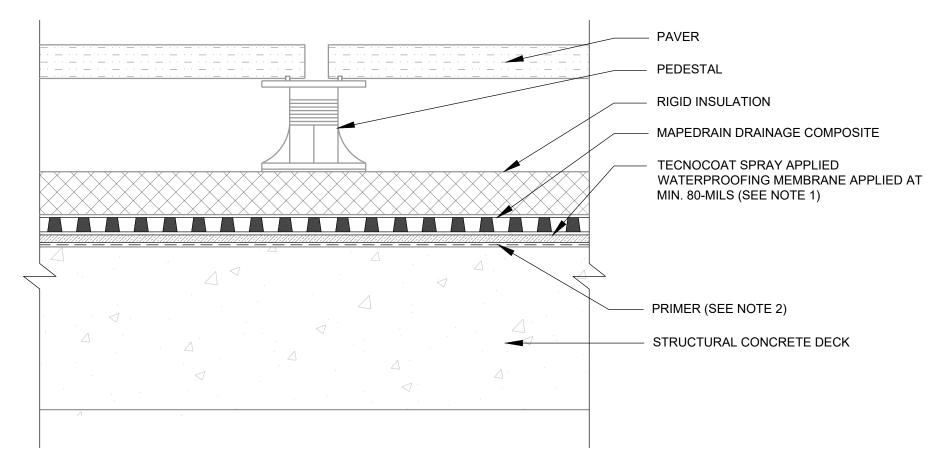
DETAILS ARE INTENDED TO BE A GUIDE FOR WATERPROOFING INSTALLATION ONLY
